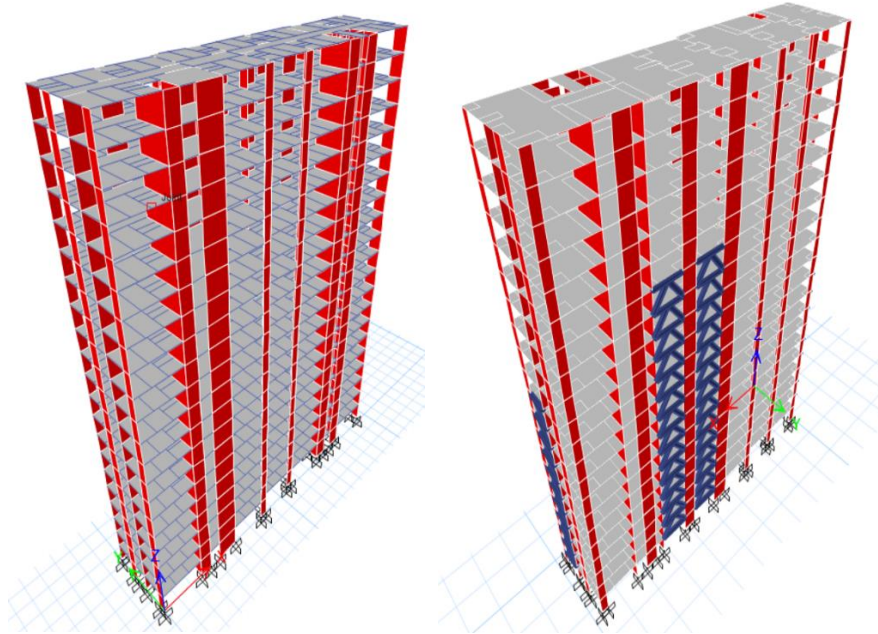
3D ETABS model of conventional slab system unbraced, and flat and pt slab system braced.
